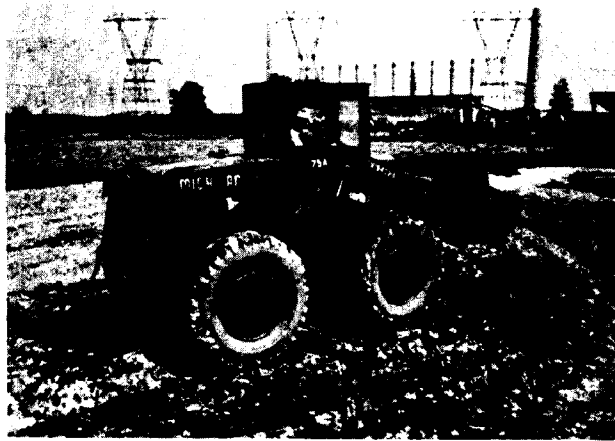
Untreated, unstabilized sludge ponded with underdrainage, one day after 3-inch rainfall.
